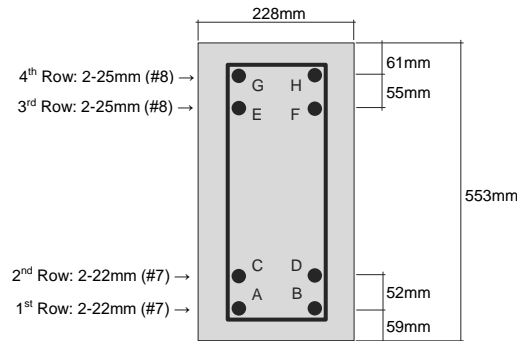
Ellingwood and Lin (1991) Beam Cross-Section
